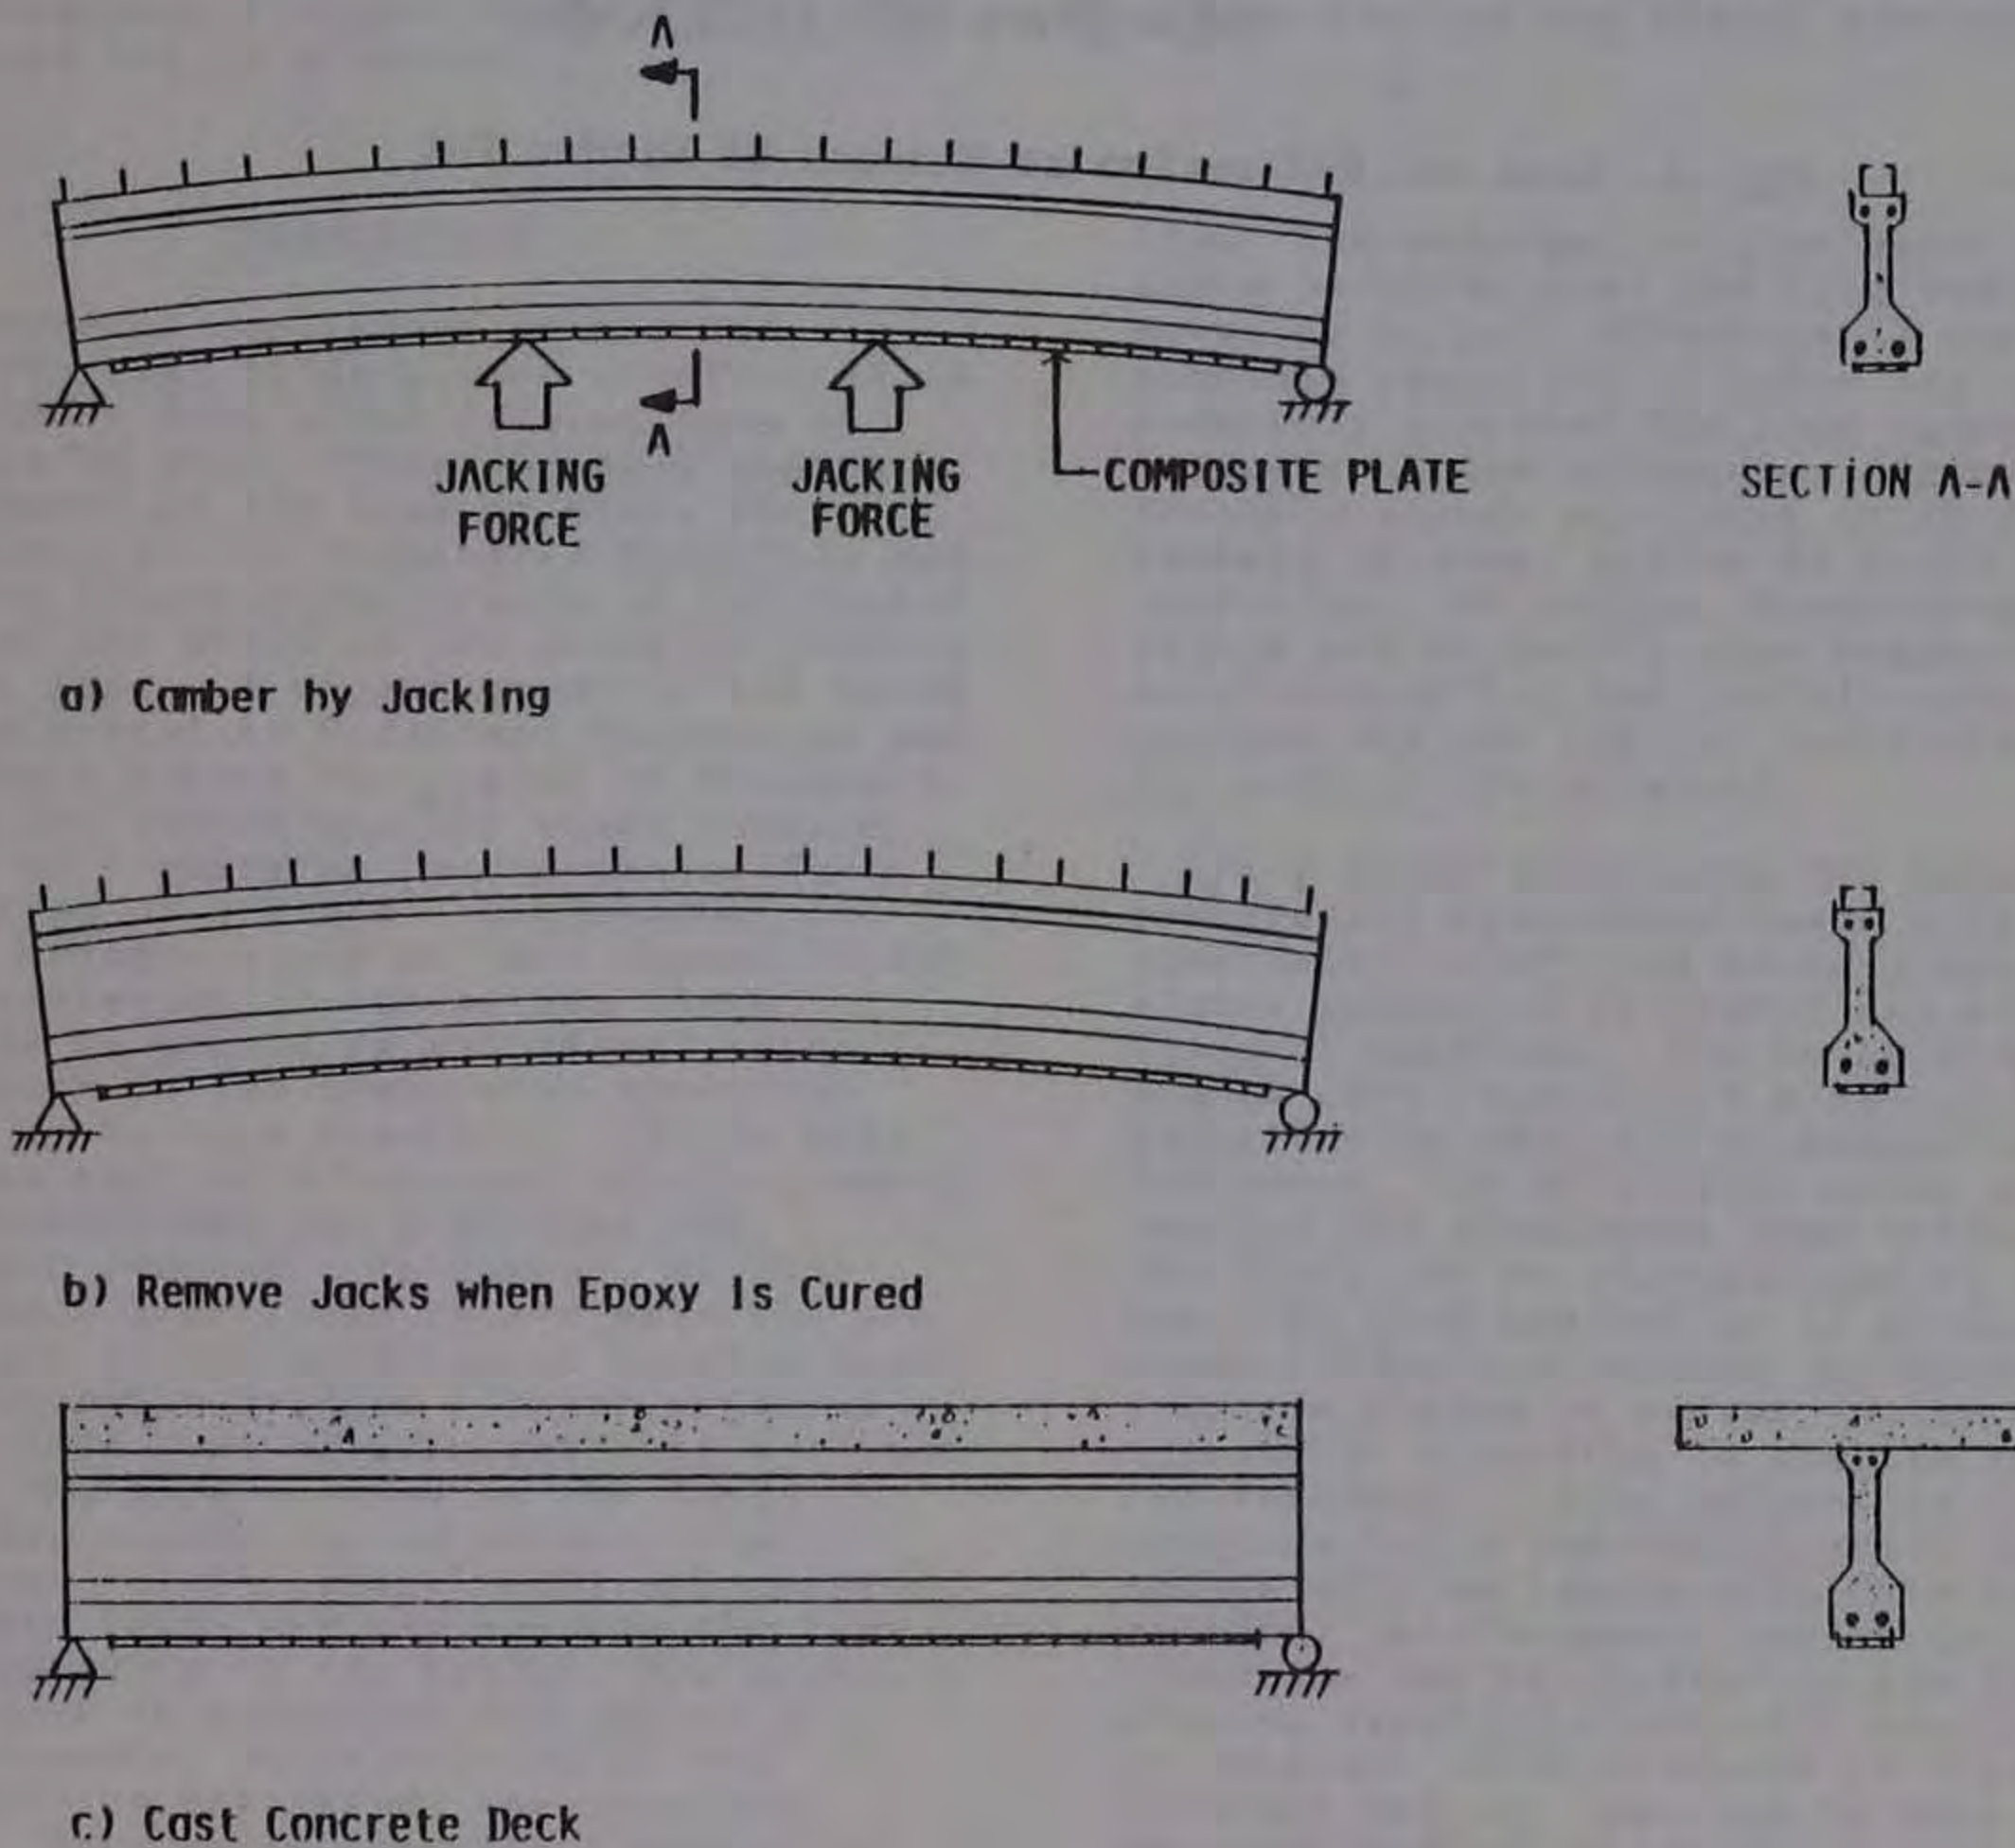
Prestressing Concrete Girder by Bonding High-Strength Fiber-Composite Plate to Tension Flange of Cambered Beam
